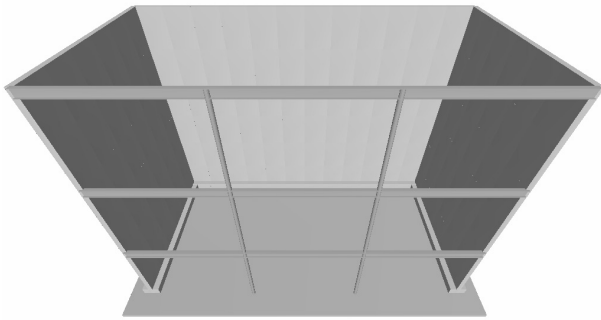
Analysis Model of Wall with U-Shaped Wall Layout.
